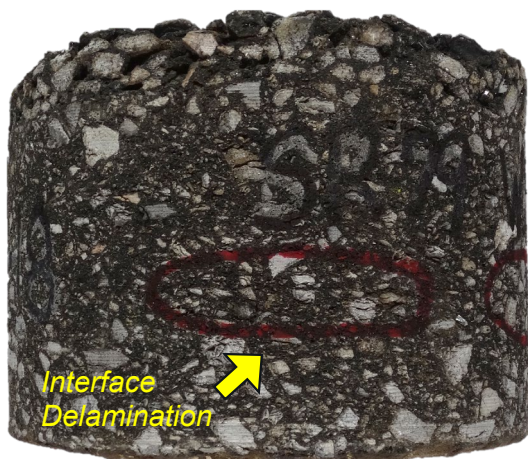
SR 79 MP 0.427 Worm Section Core – Structural AC Layer Delamination
